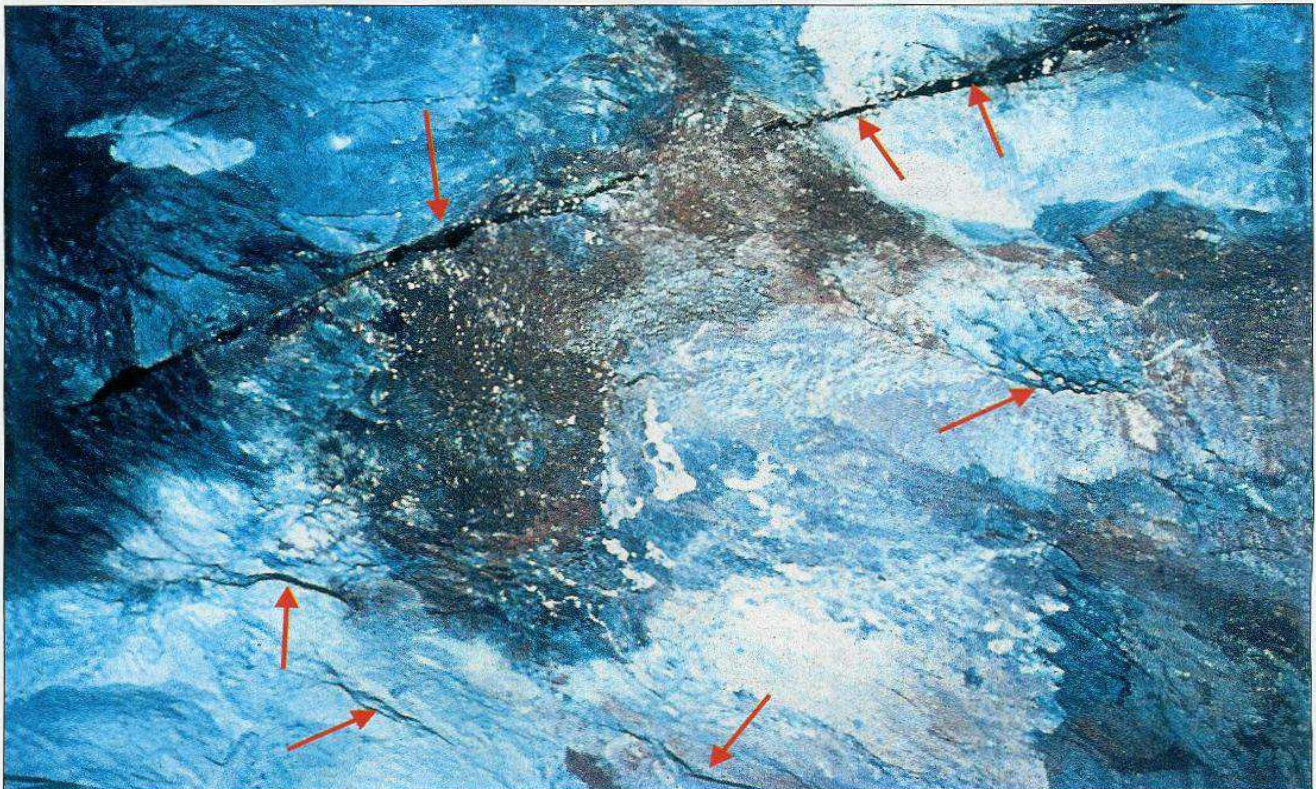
Kraghammer Sattel: rock fissures in tunnel roof filled with bitumen. Arrows lead to fissures filled with bitumen in widths of 2 cm to 0.1 mm (Schönian [5])
